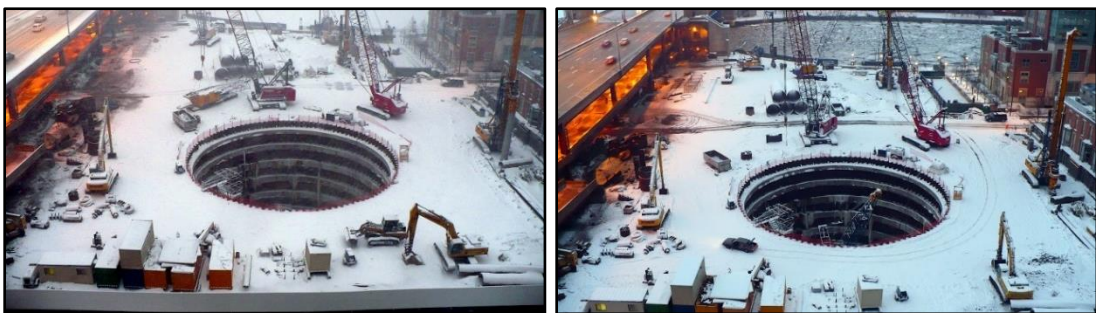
Castings concrete RB3 and fourth excavation (from -6.333 to -9.633 CCD)
